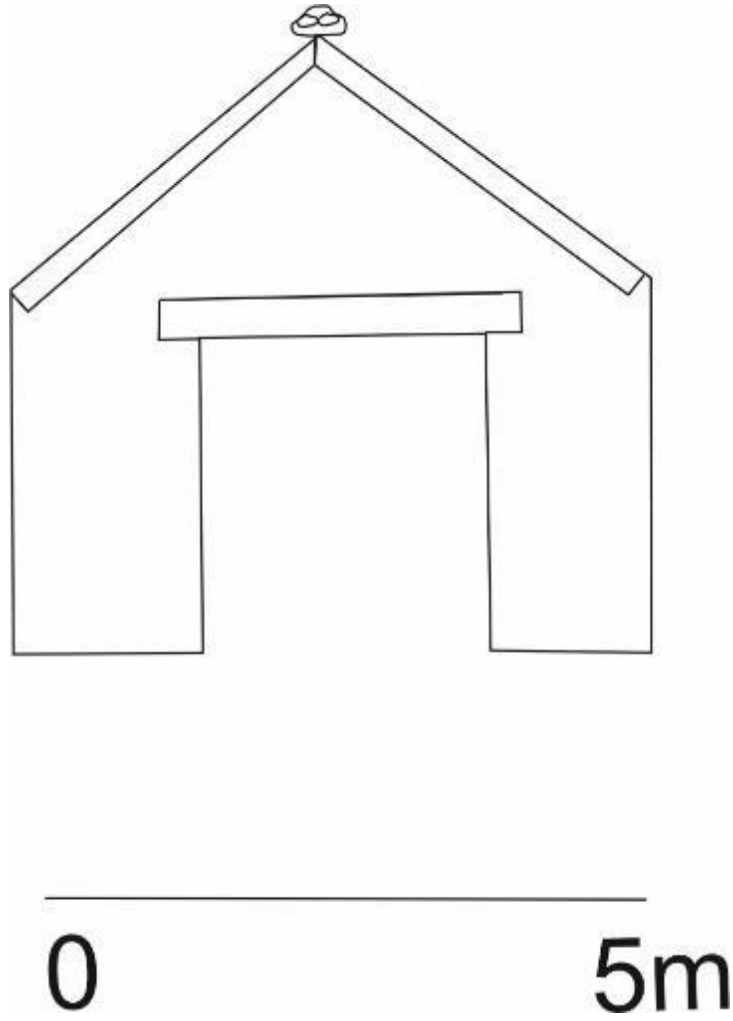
Drawn South Eastern facing elevation of Building A showing stone lintel above door and finial on point of gable.
